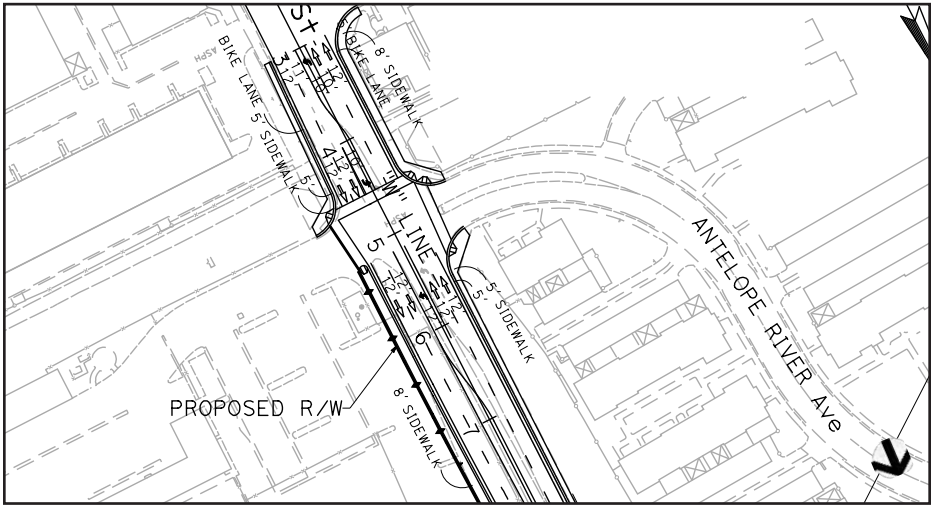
D NEW PEDESTRIAN CROSSWALK AT WARD ST./ANTELOPE RIVER AVE. INTERSECTION FROM CALTRANS I-405 IMPROVEMENT PLAN (ALT. 3)
